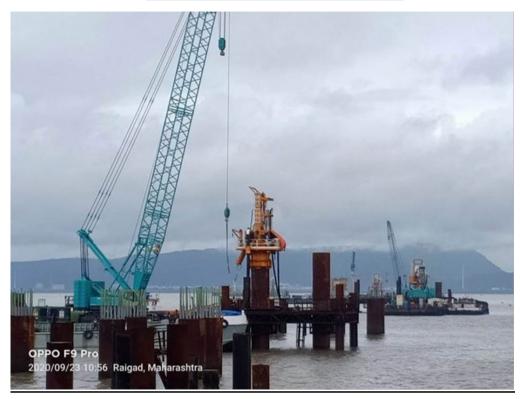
MP 126 N2 Top Cage Welding - Marine Area in progress
